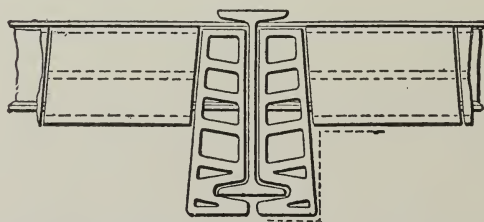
End-construction, with Side Raised Skew-back Beam Covering.
